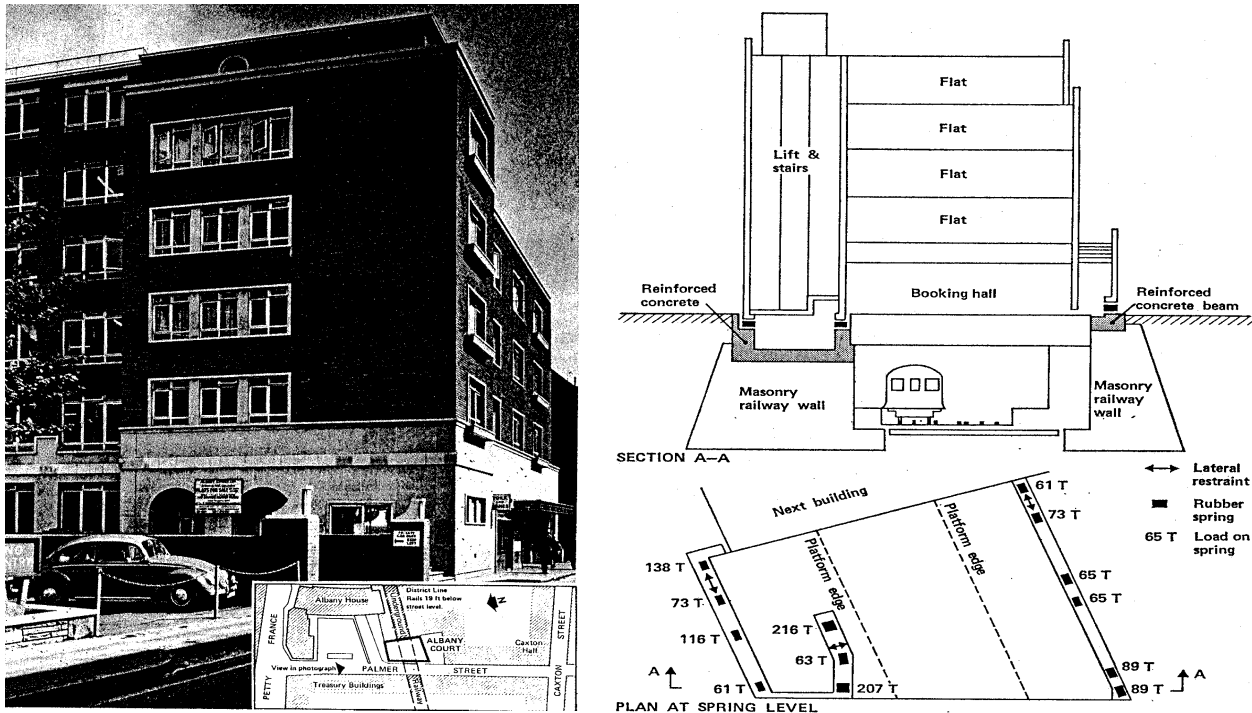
The first example of a base-isolated building in the UK is Albany Court, a block of flats constructed on rubber bearings over St James’ Park Station, London in 1965 (reproduced from Waller [134]).
